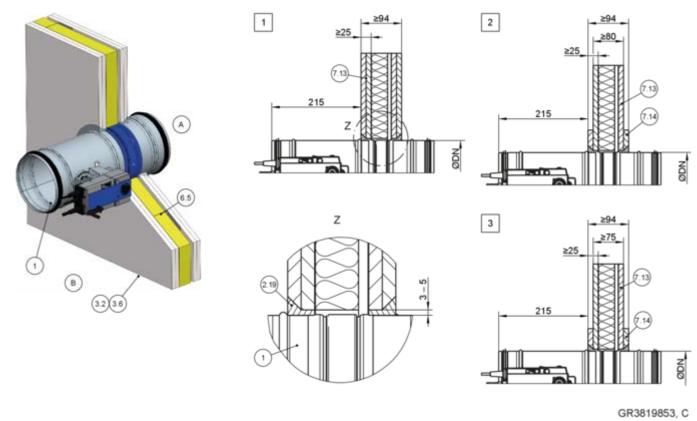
Dry mortarless installation into a lightweight partition wall, without installation kit
